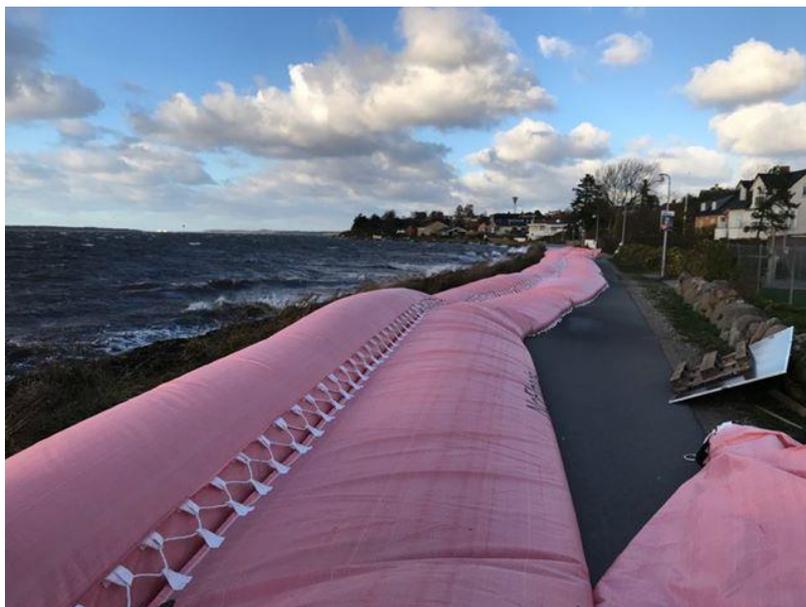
Flood protection measures – installation of the water tubes (2/2).
